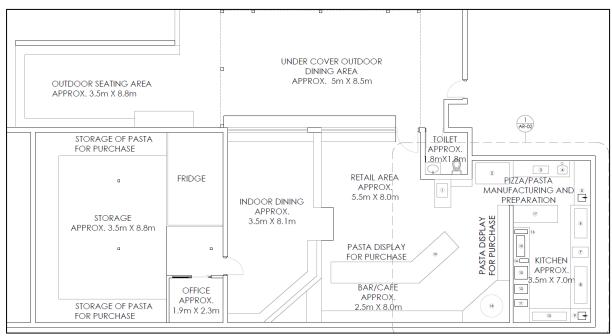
Proposed Floor Plan of Tenancy (source: Drafter)
